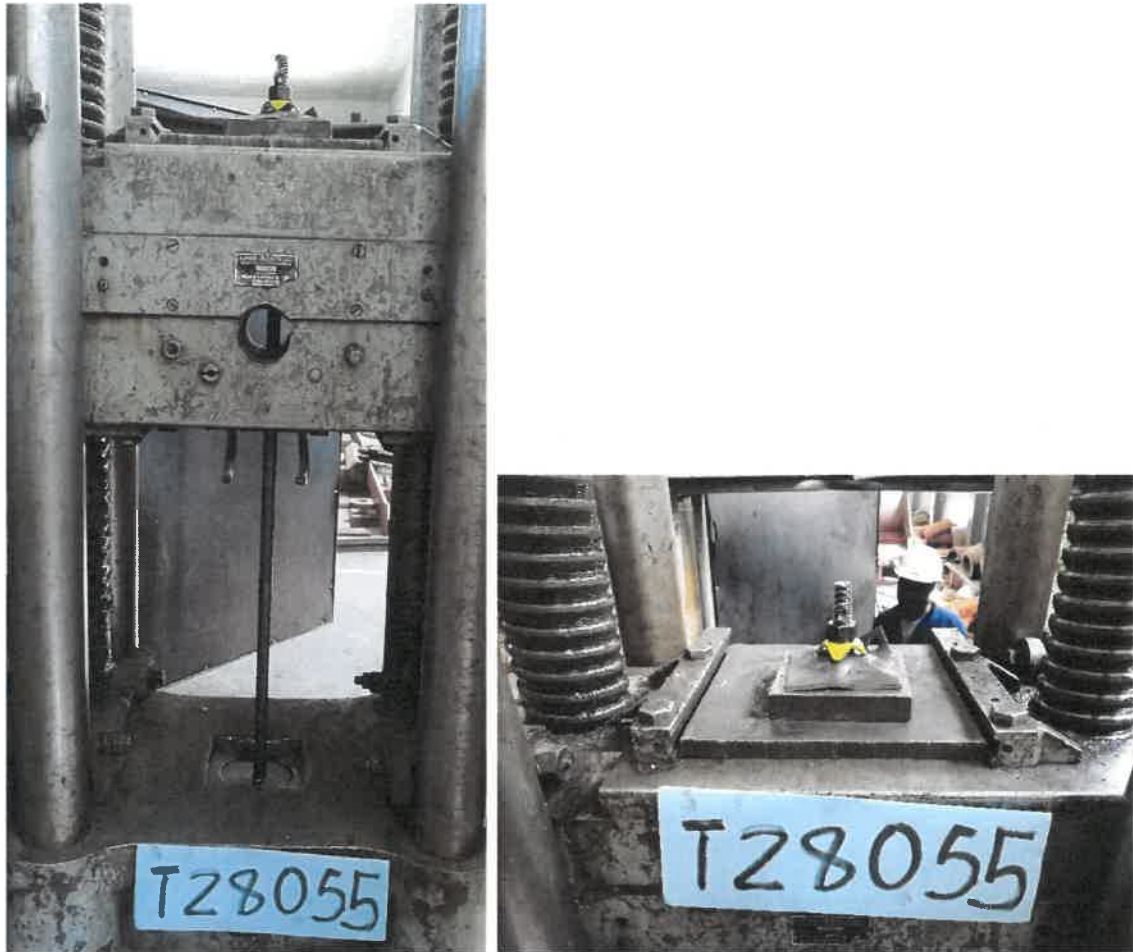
Roof bolt assembly (20 mm x 1.5 m) installed in the testing machine
